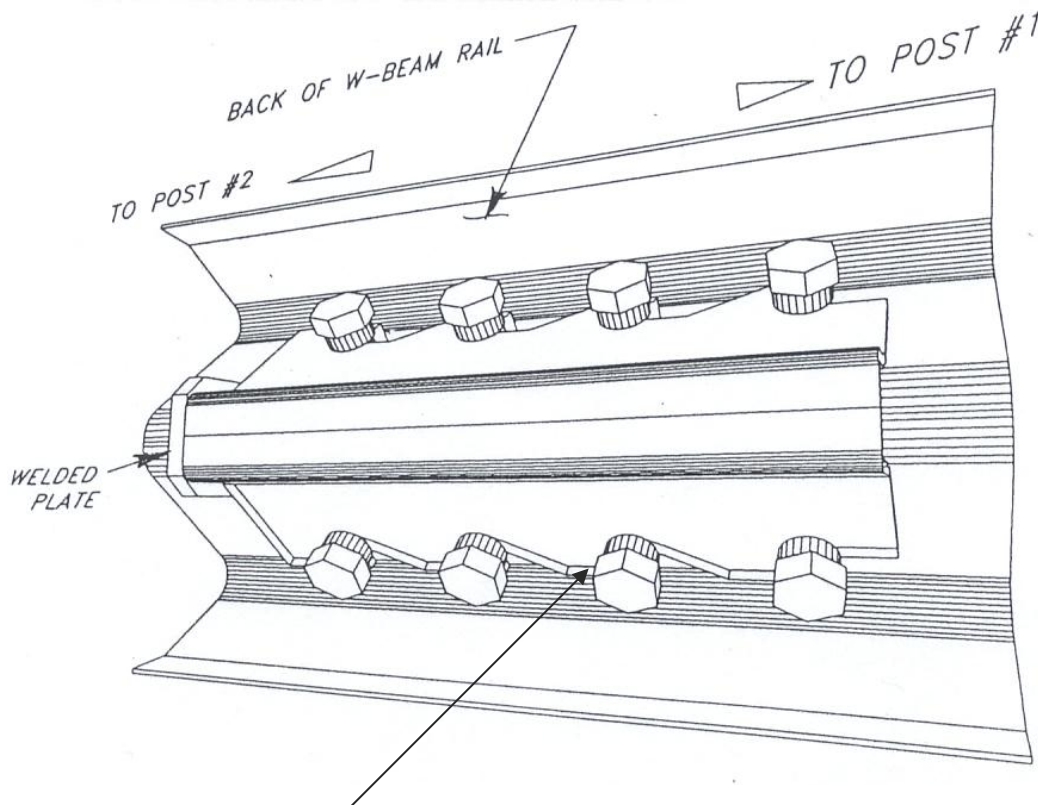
Installation of Cable Anchor Bracket Shoulder Bolts.
